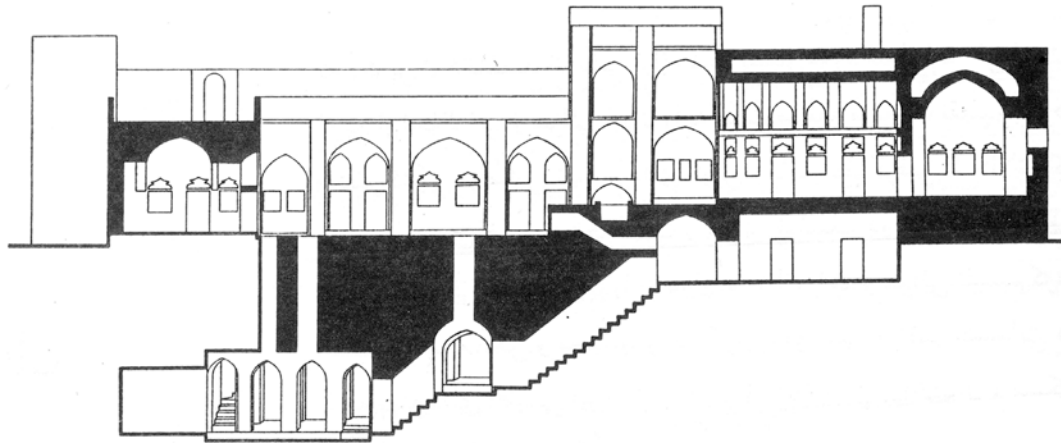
In large family houses, fresh water was collected from Sard'ab, a subterranean room connected to underground water channels (source: Pirnia 2006)
